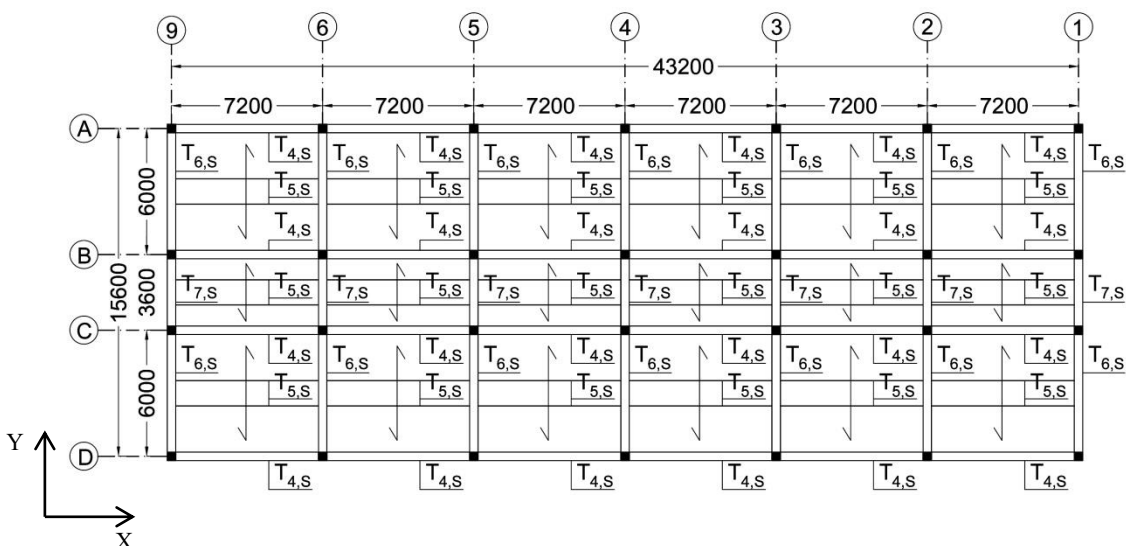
Roof plan with alphanumeric alignment identification and steel beam numbering
